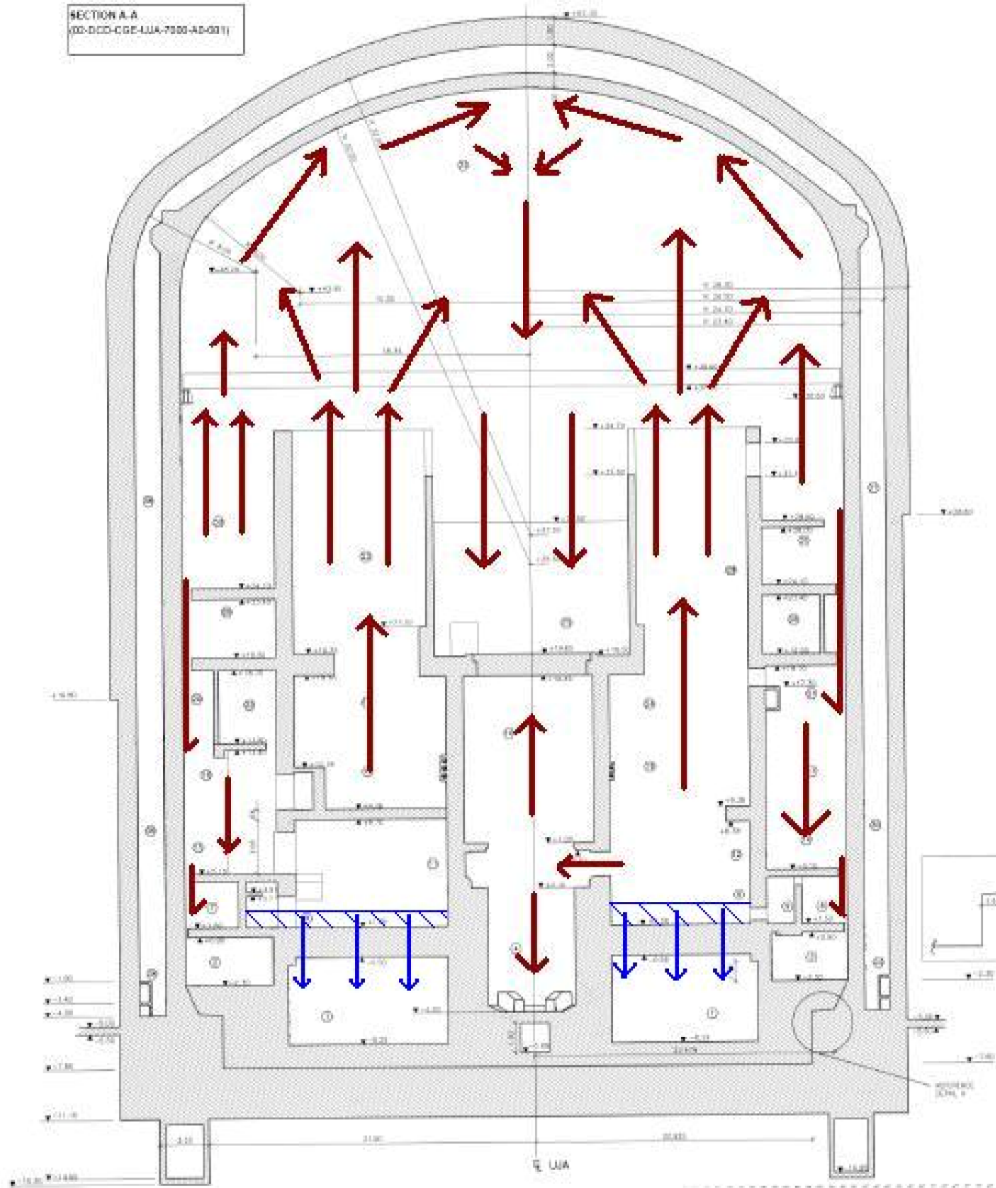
Flow from the Access Area to the North Staircase and the Elevator
